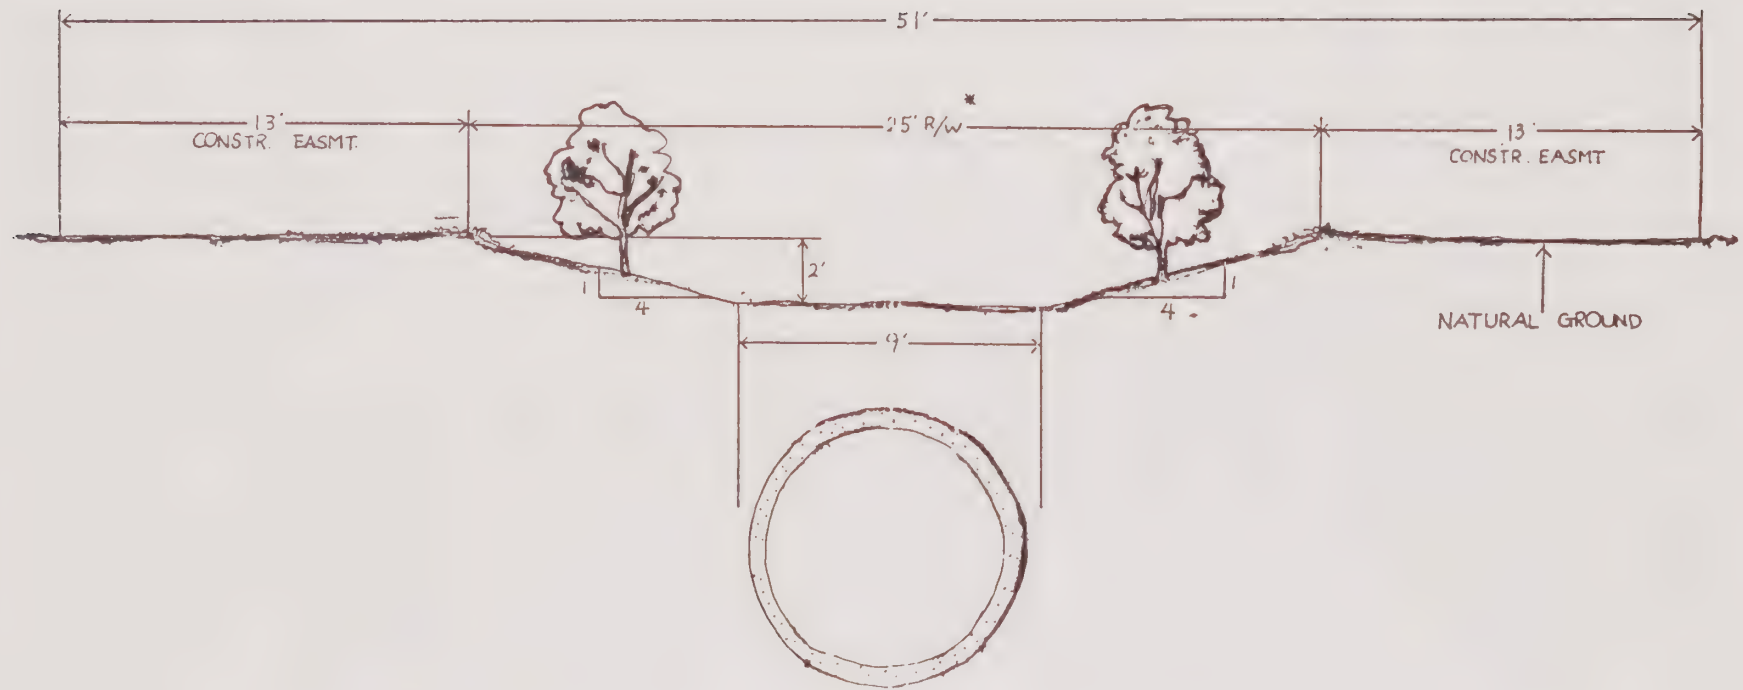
TYPICAL SECTION FOR PIPE OR BOX
